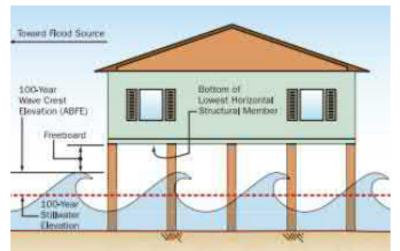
Structure Elevated Above Base Flood Elevation. Source: University of Connecticut
